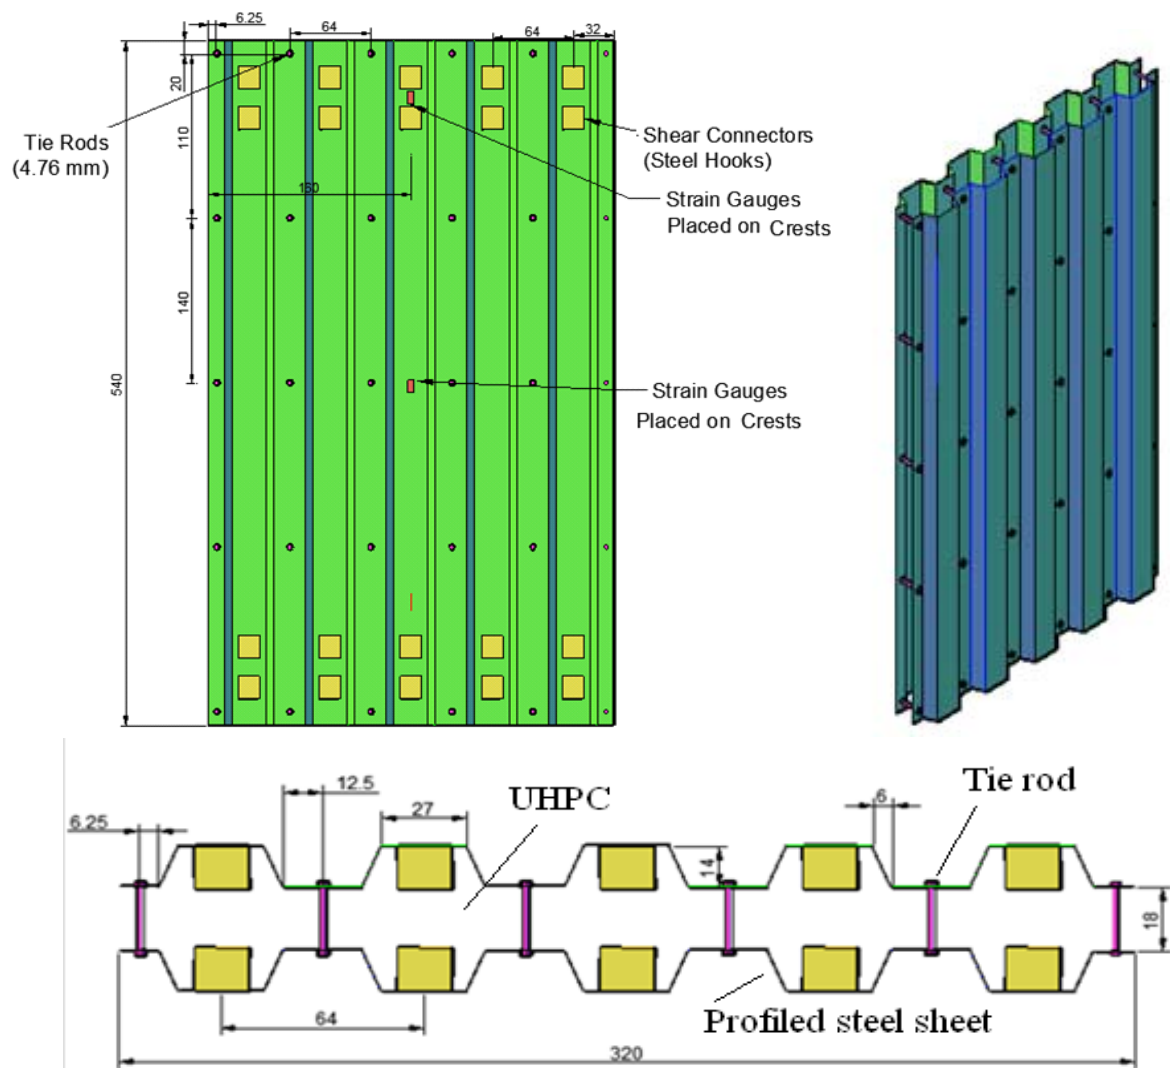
Geometric dimensions of composite walls (dimensions in mm)
